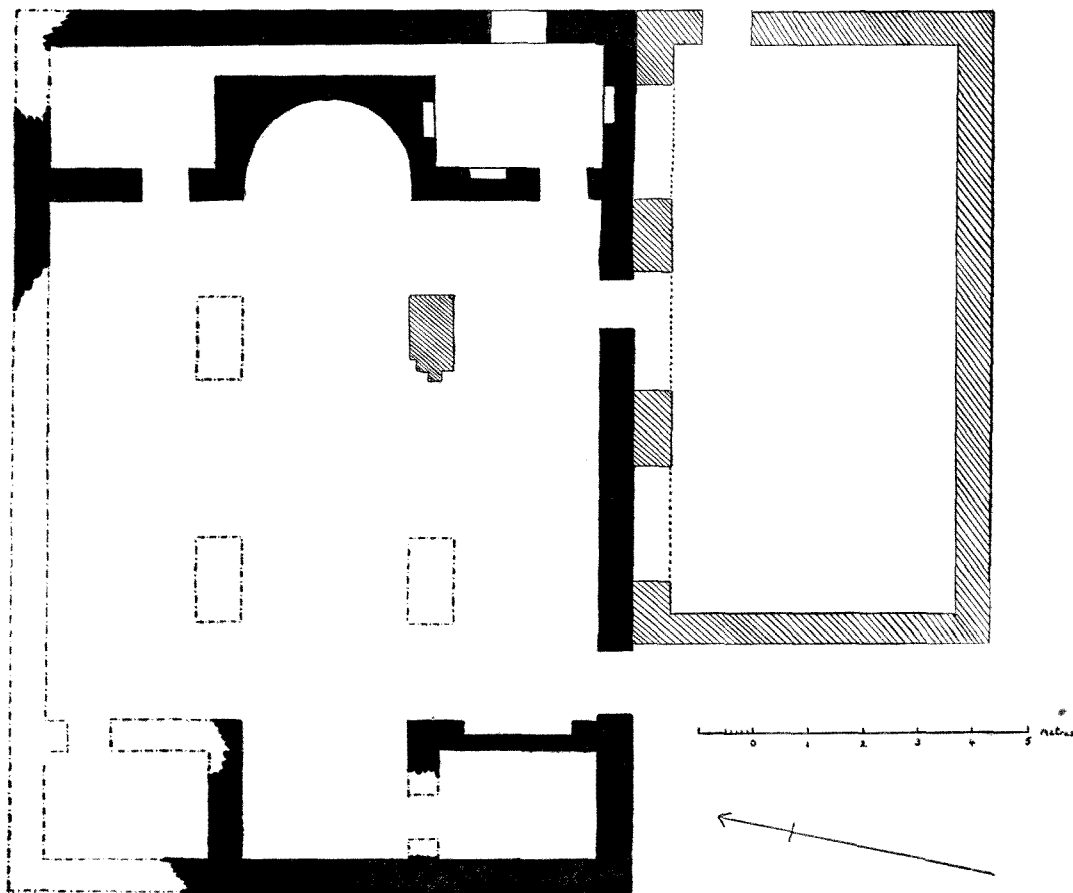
PLAN OF CHURCH AT UKMA EAST
